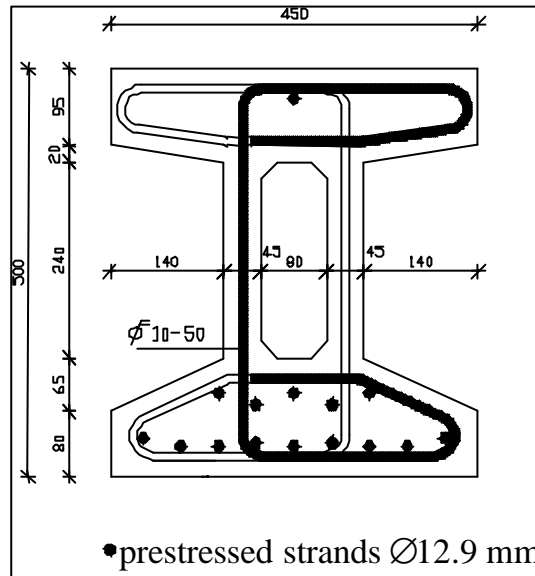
Cross-section of the beam provided with the stirrup reinforcement.
